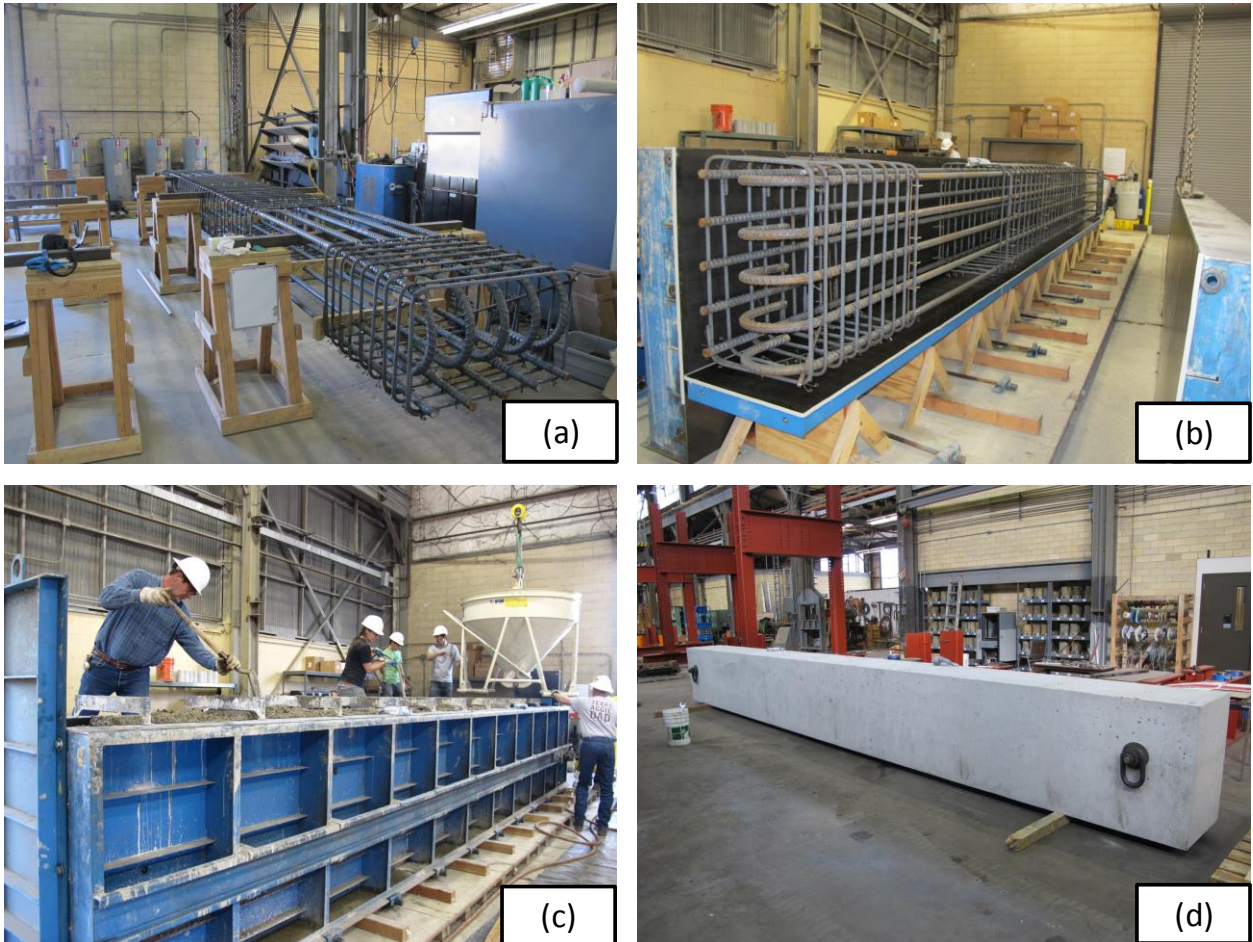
Specimen construction process. (a) completed reinforcing cage; (b) rotated cage set in formwork; (c) concrete placement; (d) completed specimen.
